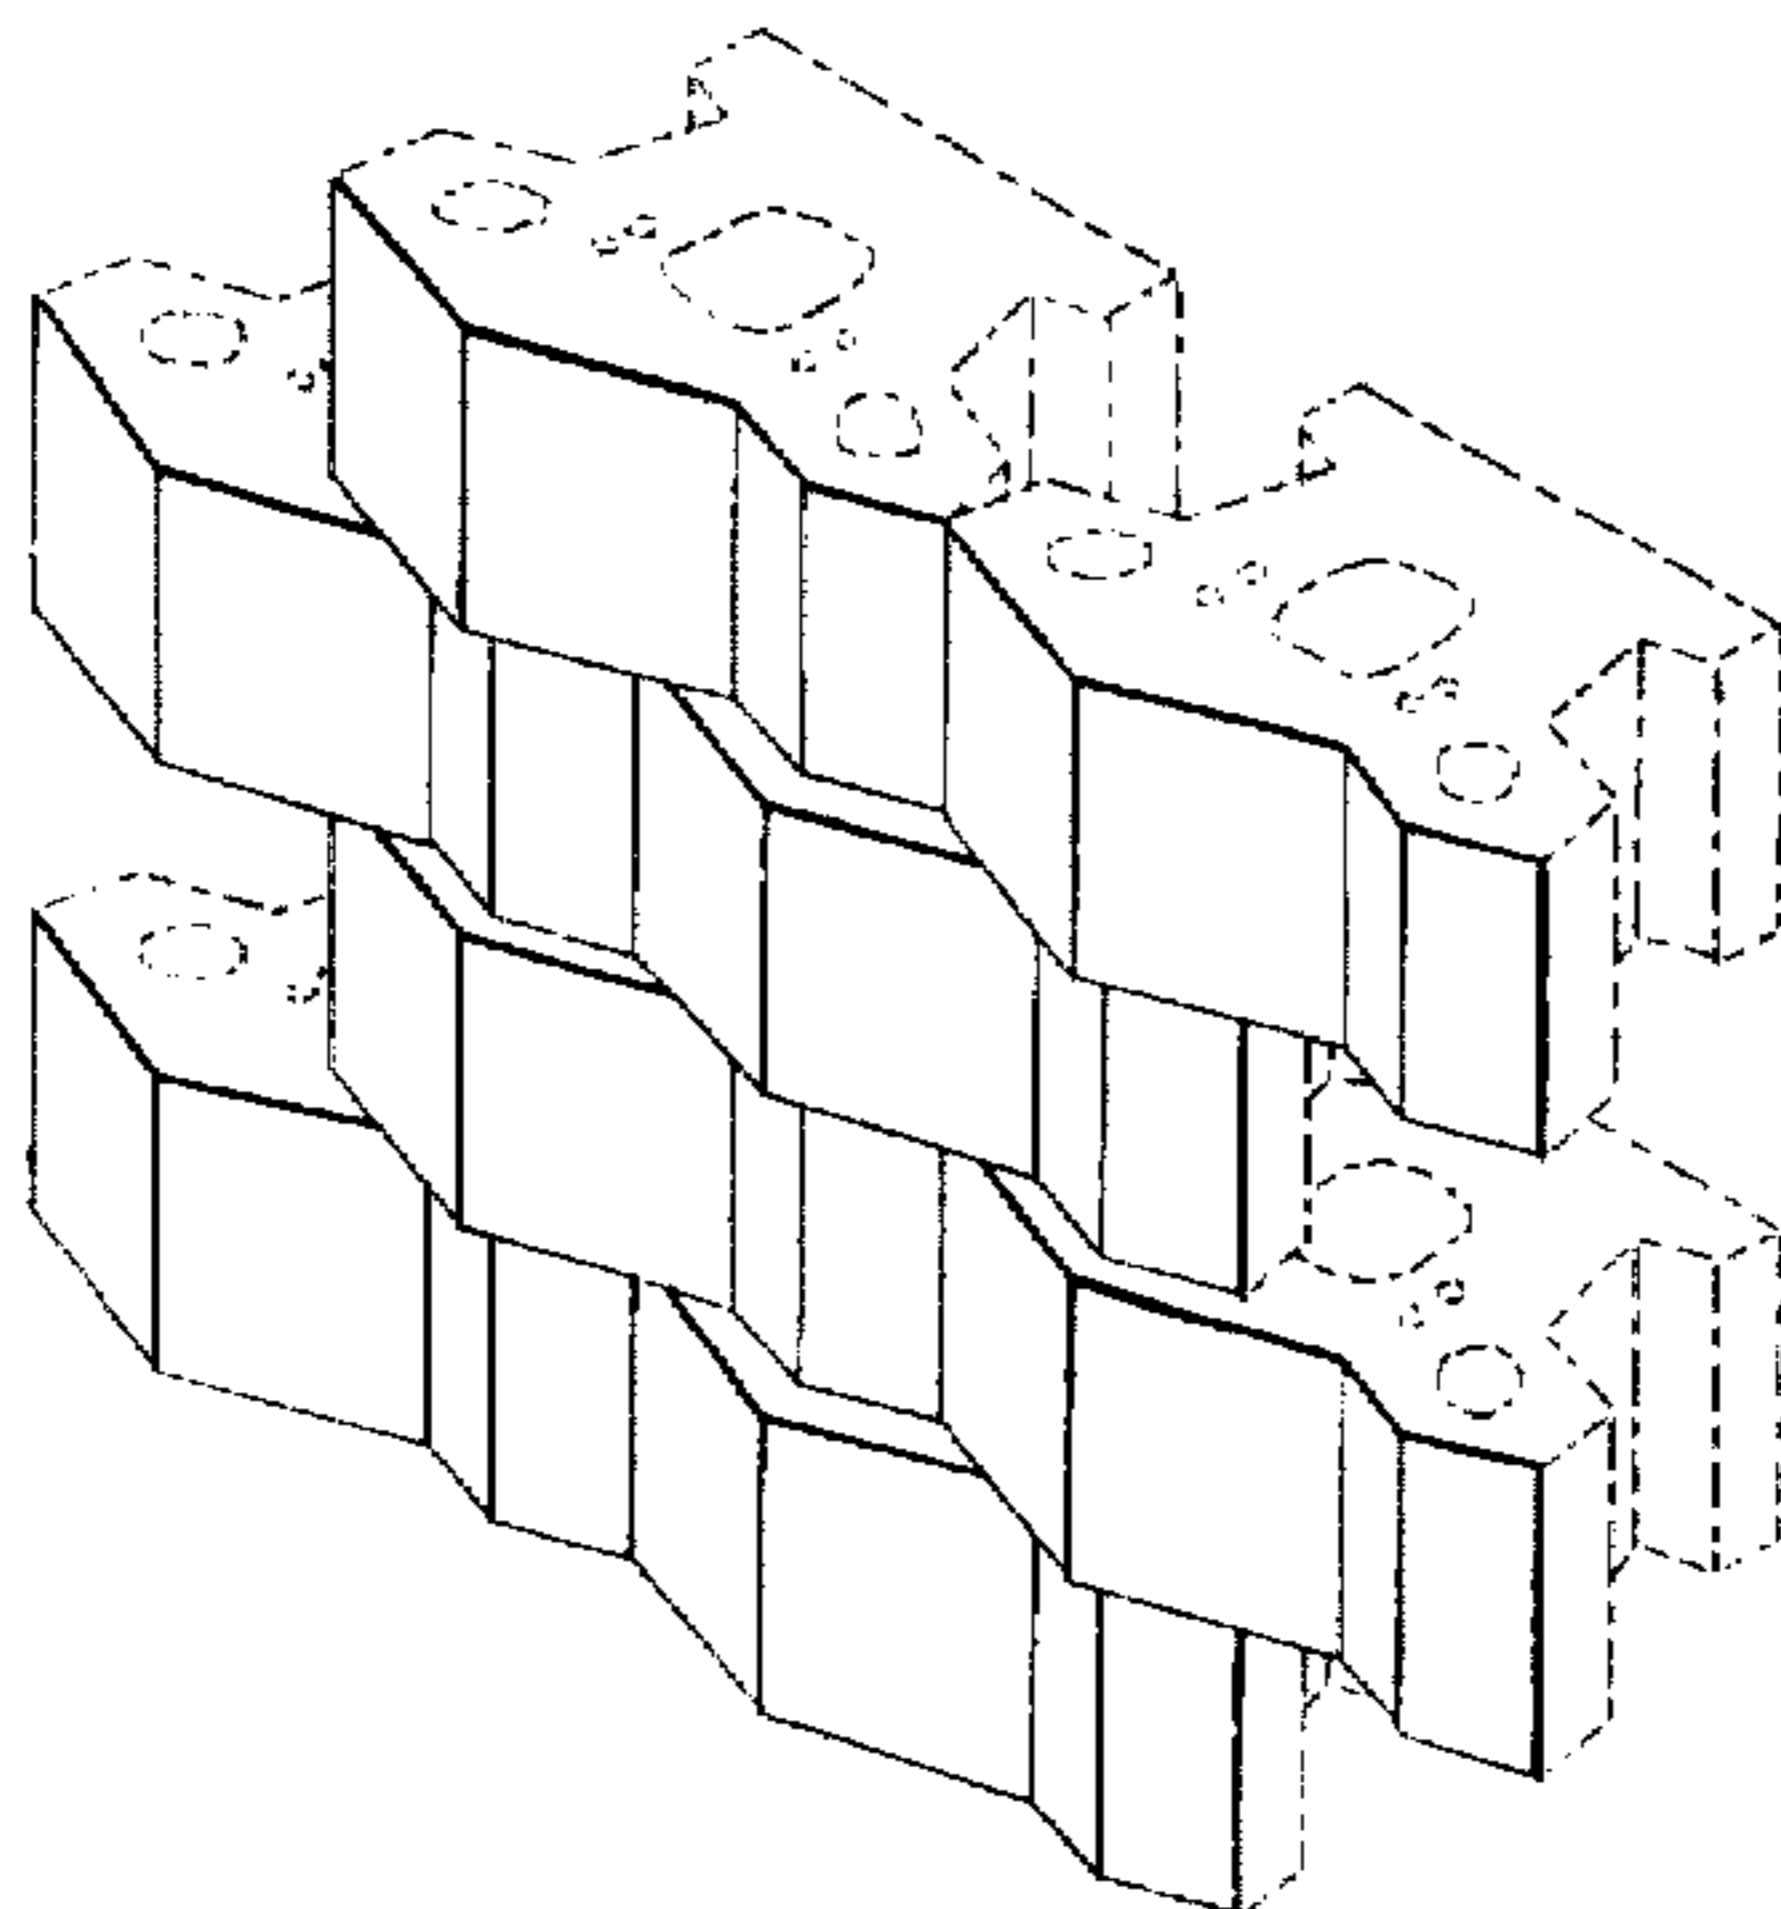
is a perspective view of a fourth modified embodiment of the design shown in FIG. 1-7;
